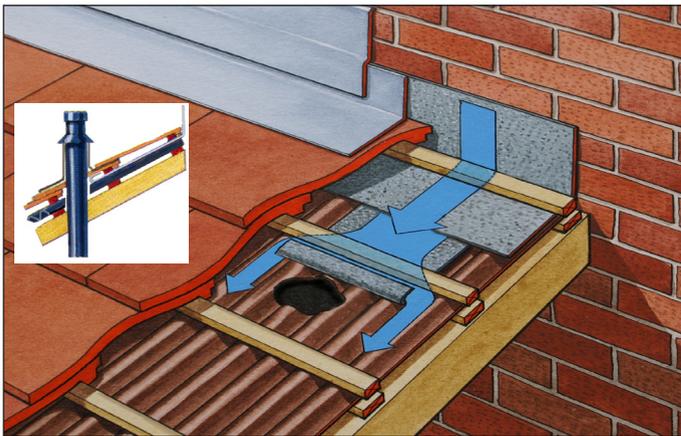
Tile Ventilator or soil vent pipe flashing unit detail
